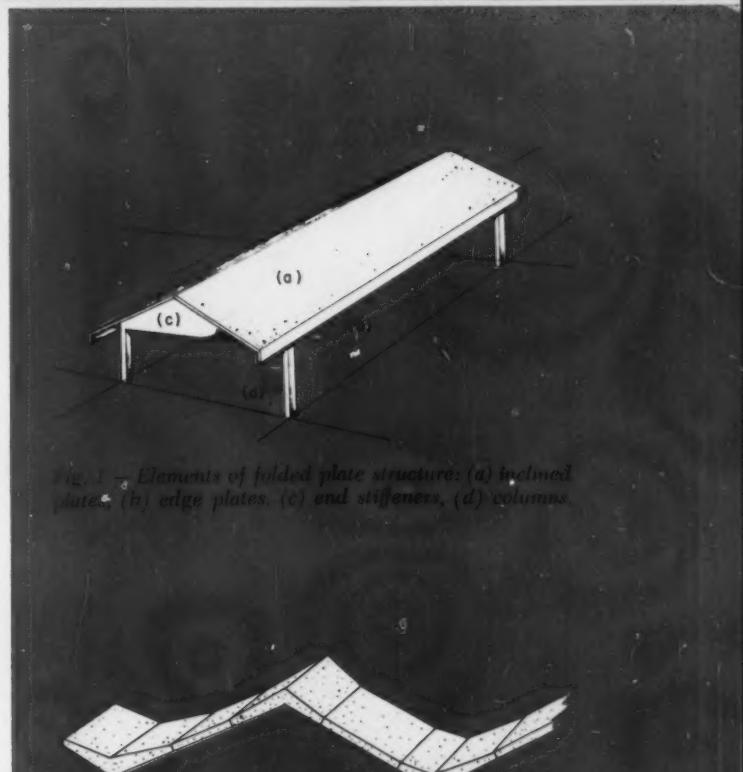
Elements of folded plate structure: (a) inclined plates, (b) edge plates, (c) end stiffeners, (d) columns.
